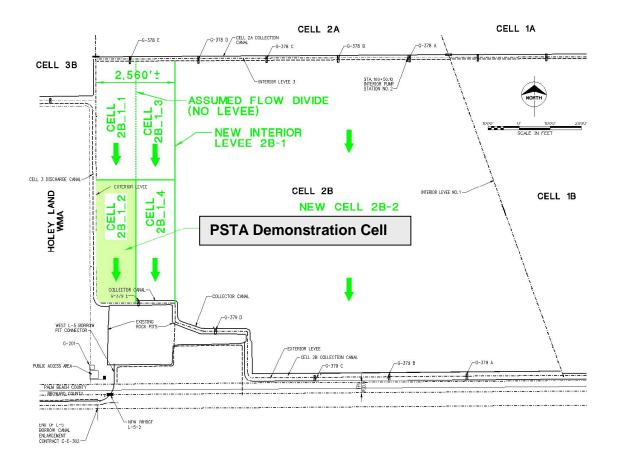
Conceptual Plan, PSTA Demonstration Project in STA-3/4
